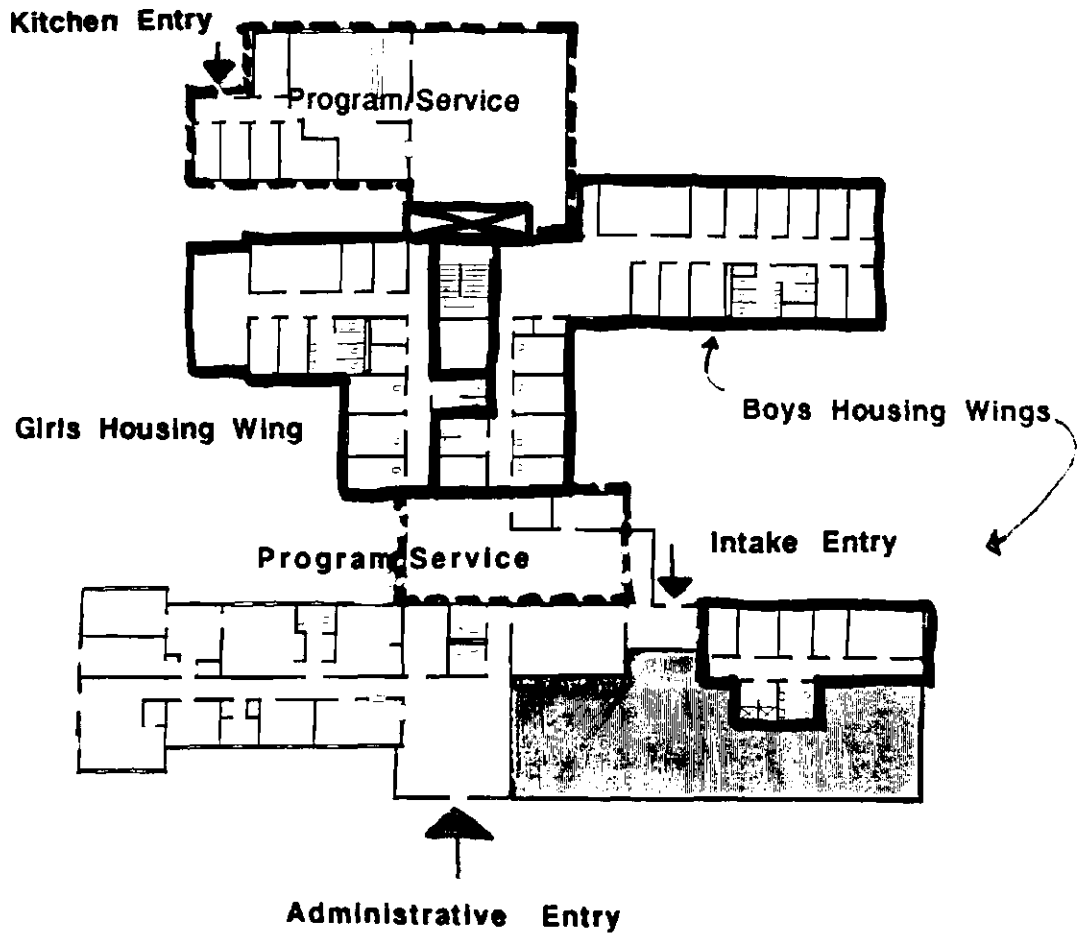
MAR - Floor Plan showing a Modified Pavilion Plan (Telephone Pole)
